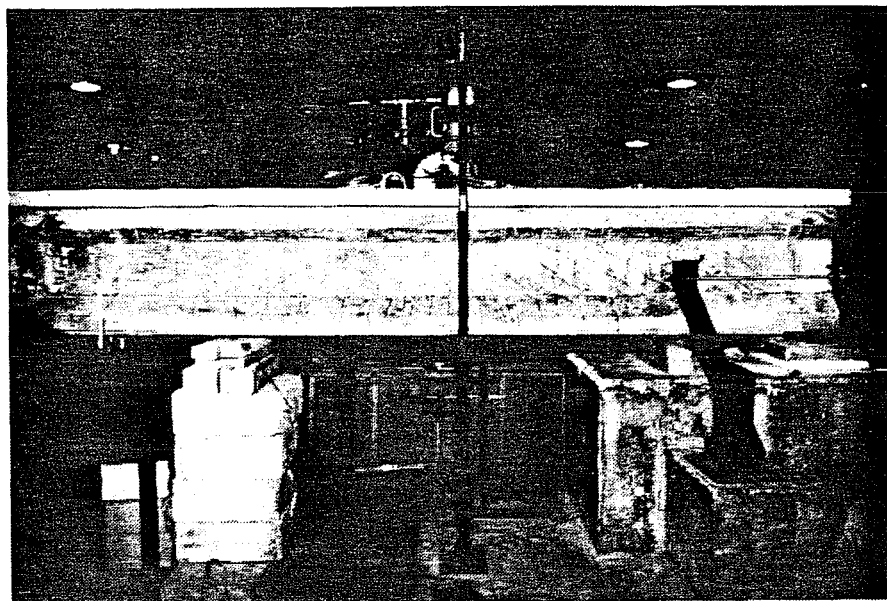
Photographs after shear failure - south end, Specimen 1:
